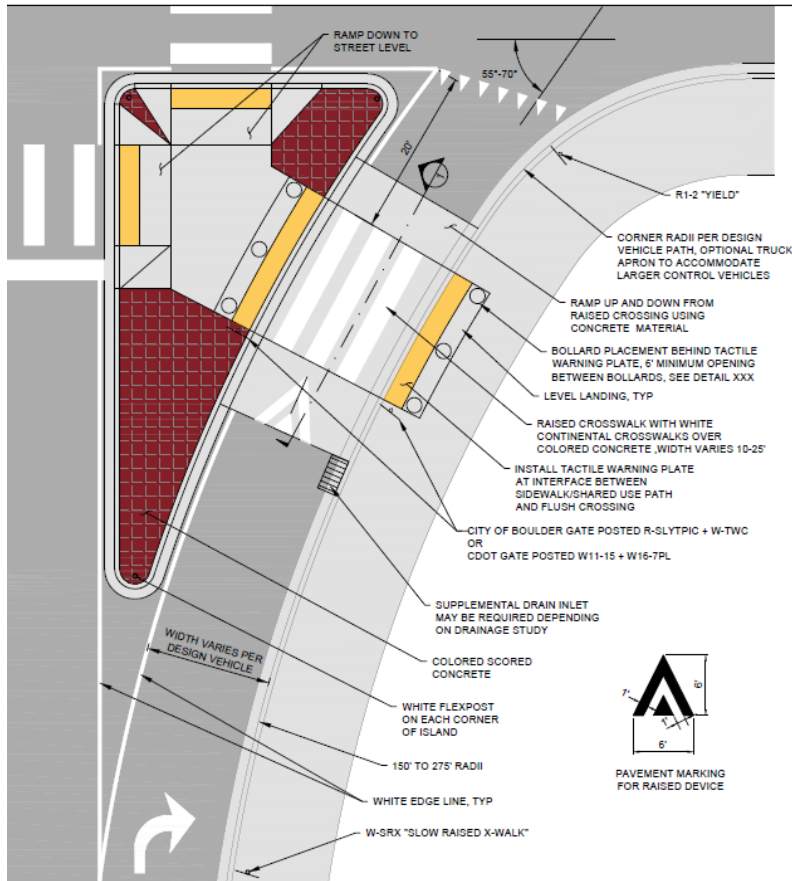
Typical Layout of Raised Crossing at Channelized Right Turn Location
